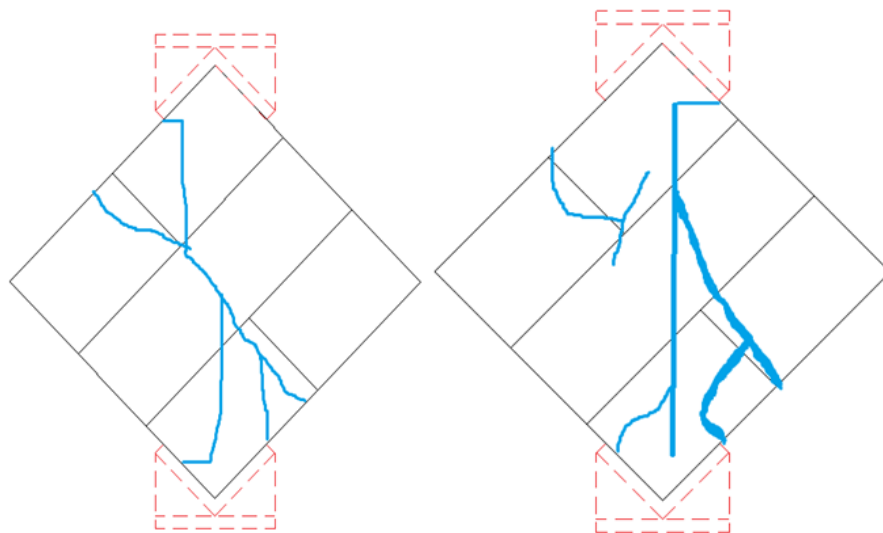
Examples of final cracking patterns in 60 cm x 60 cm masonry wallets.
